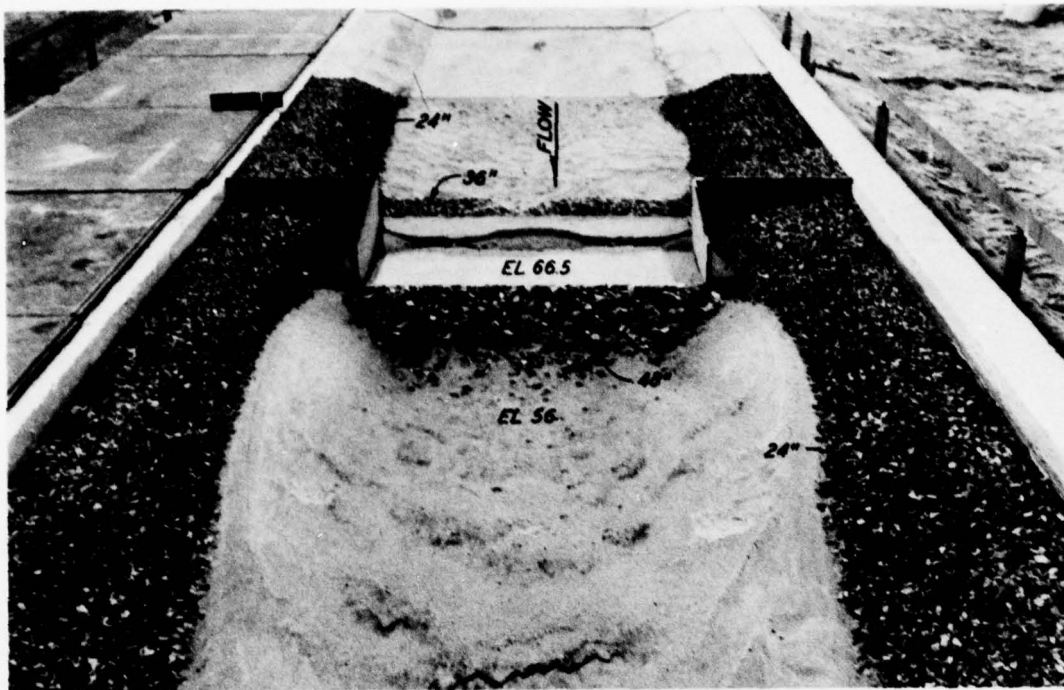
Drop structure 1, type 10 riprap plan (stable); looking upstream after 1-hr (prototype) operation with 27,800-cfs flow
